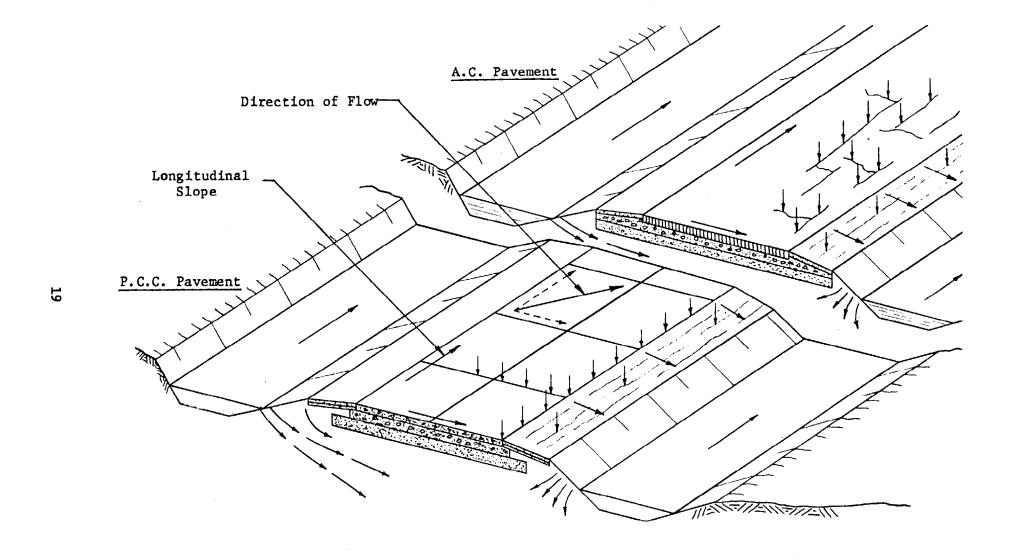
Points of Entrance of Water Into Highway Pavement Structural Sections (16)
